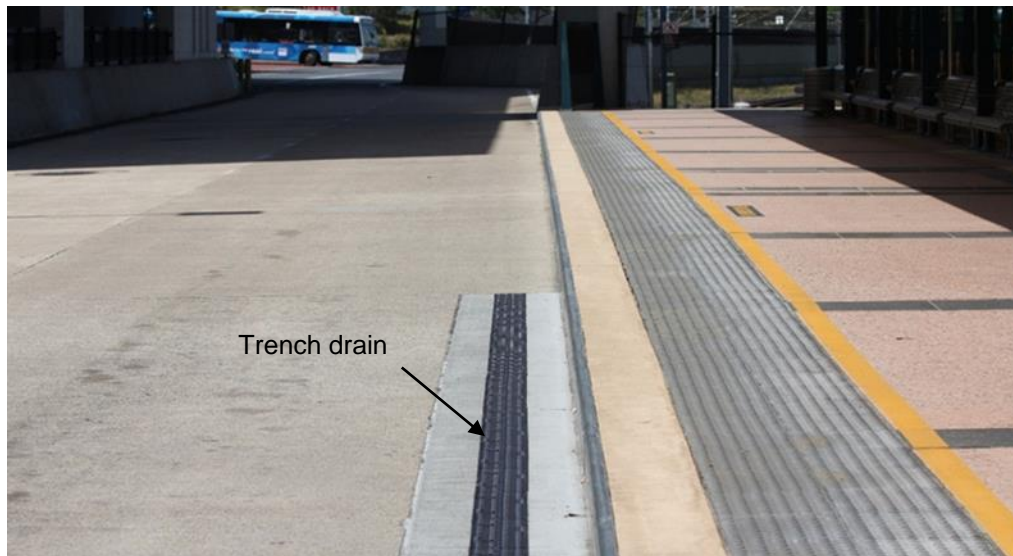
(B) – Immediately adjacent to concrete kerbs
